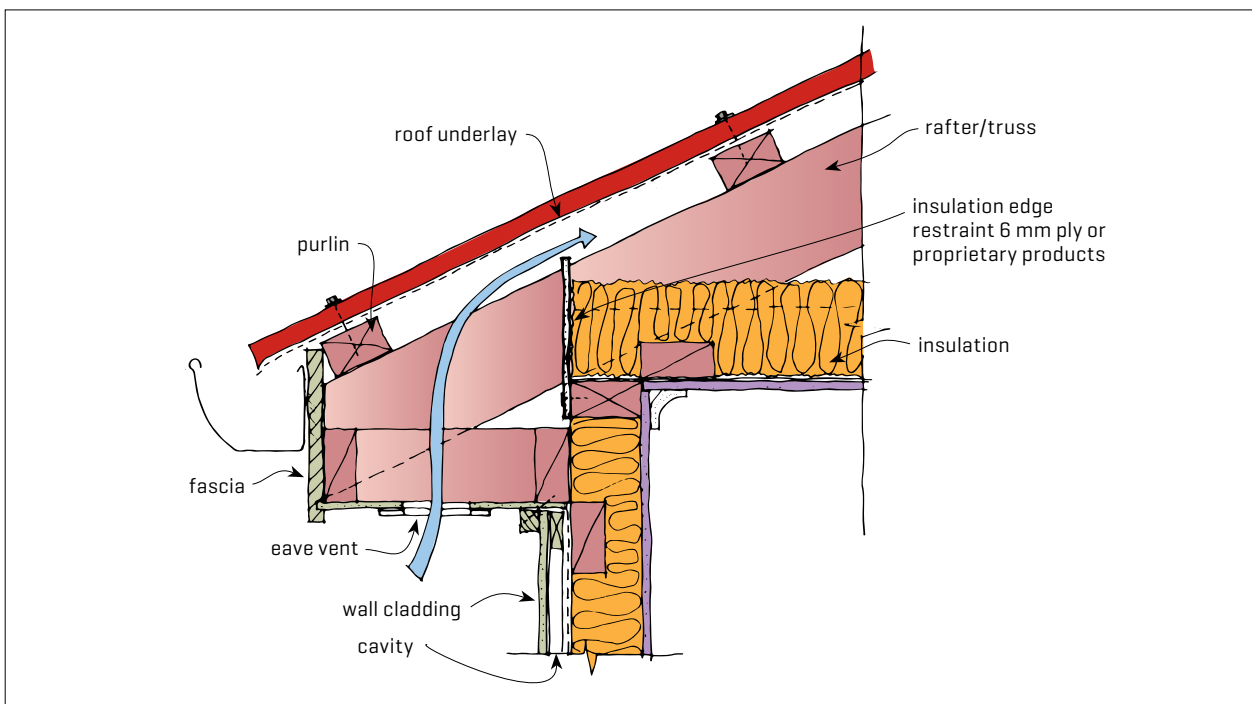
Eave ventilation with insulation barrier enabling natural airflow throughout the roof cavity.
